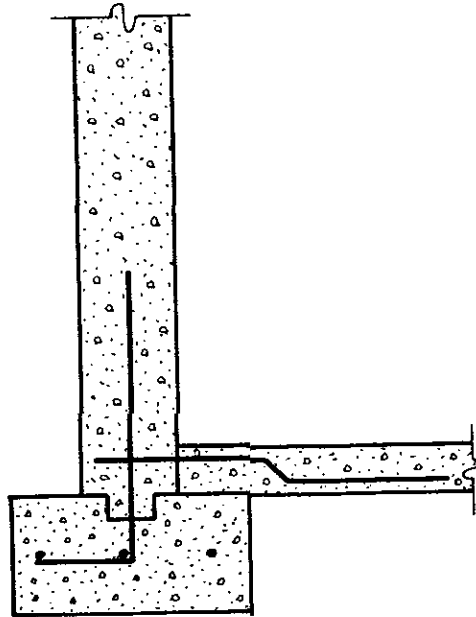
Wall, slab, and footing. Anchored to act monolithically. (Reference 8)
